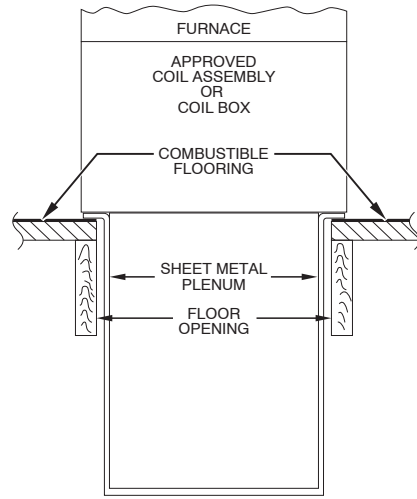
Furnace, Plenum, and Coil Assembly or Coil Box Installed on a Combustible Floor
